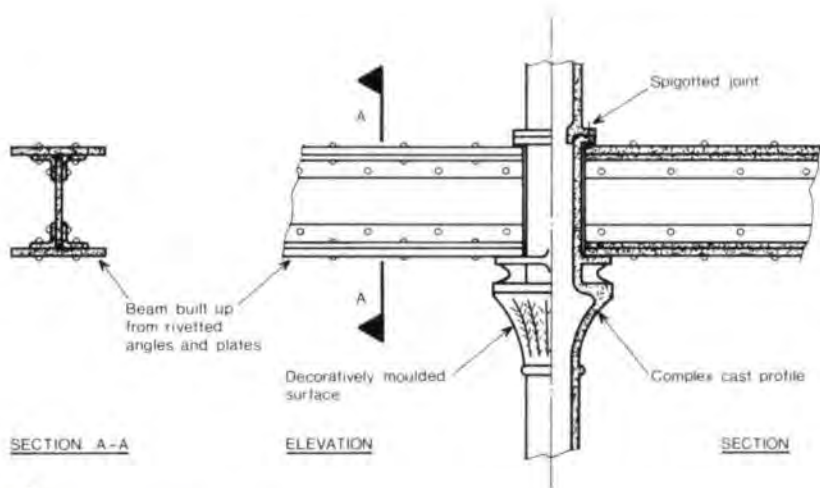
Typical iron-framed construction: cast iron columns and wrought iron beams. Characteristic features are noted.
